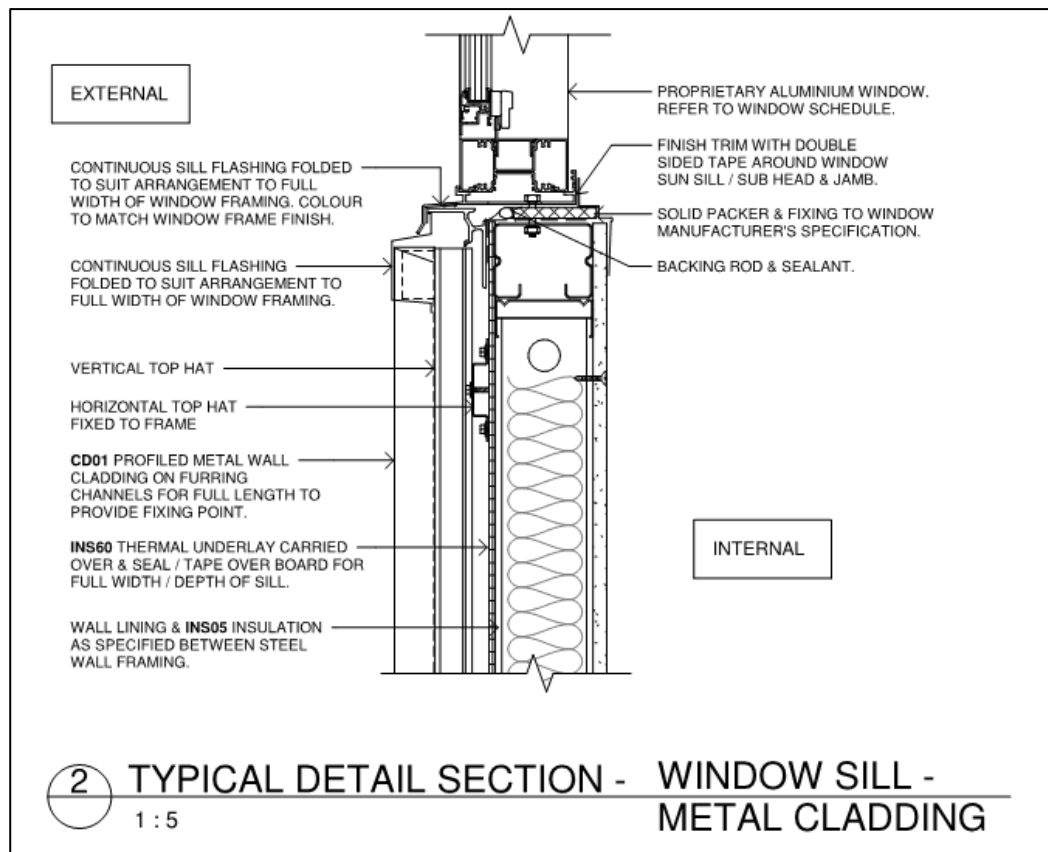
Typical window sill detail : Source – Plan M-AR-DW-5104 Typical Details – Sheet 4
